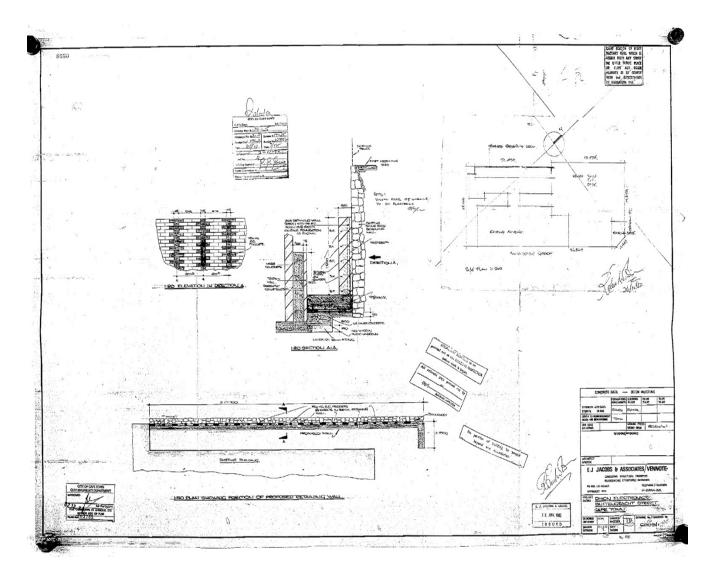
Rear retaining wall detail drawings E J Jacobs detail drawings for new retaining wall set in front of existing neighboring stone wall at the era of the property
